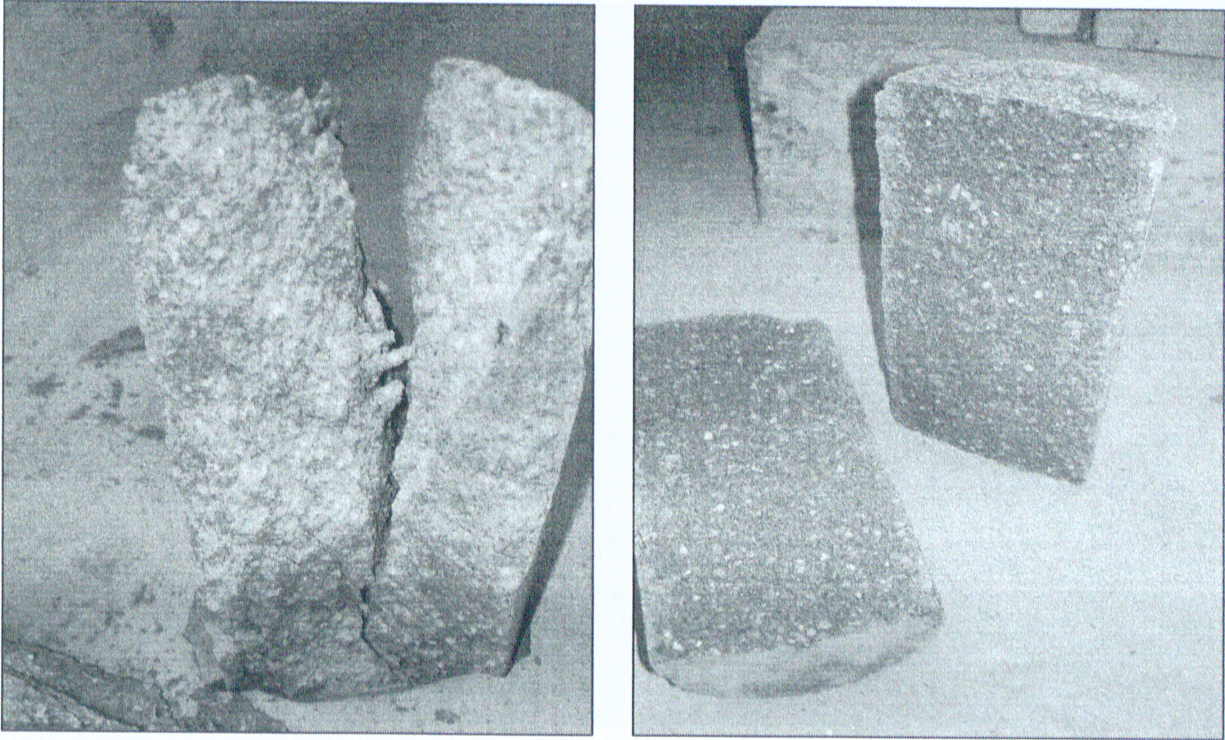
Core testing of the Verticoat Supreme grout (compression and in-direct tension tests)
